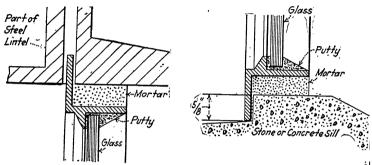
Head detail at lintel in Fig. 207.—Sill detail in brick wall.
